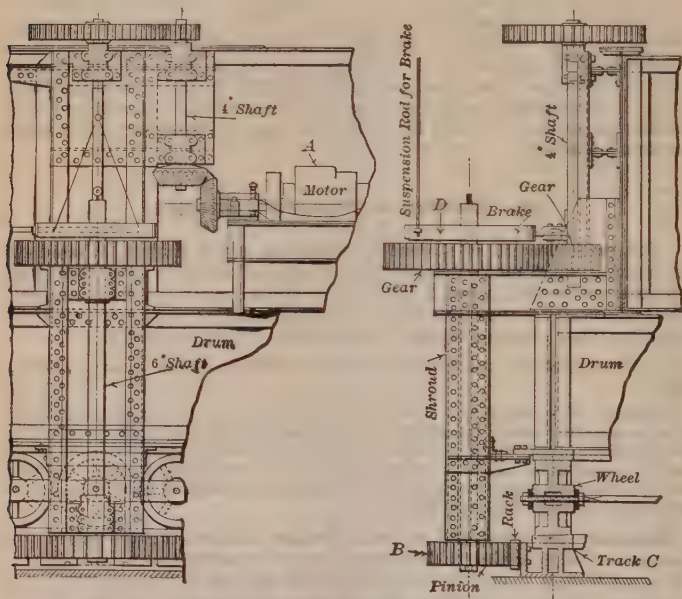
Turning Mechanism, Charlestown Bridge, Boston, Mass.
